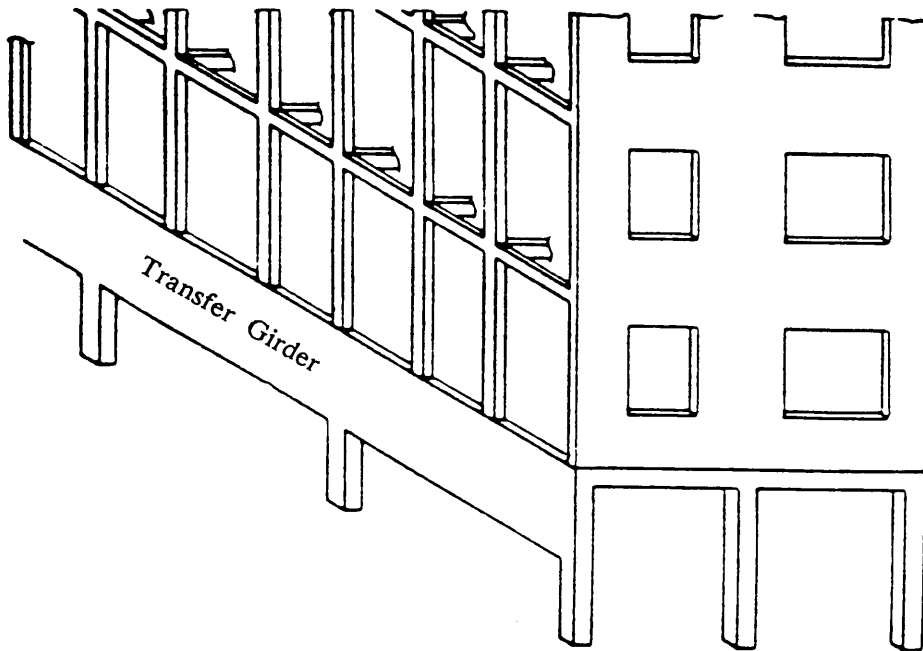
The use of transfer girder and frame supported shearwalls in high-rise buildings
